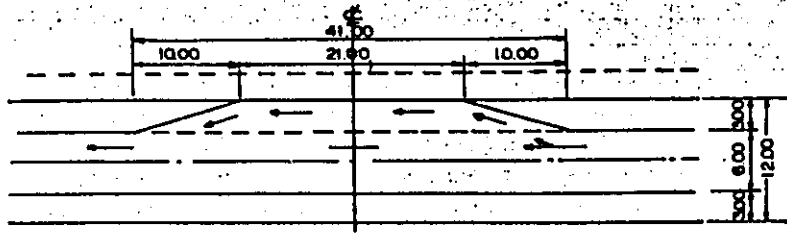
RECOMENDED LAYOUT OF PUJ BAYS
